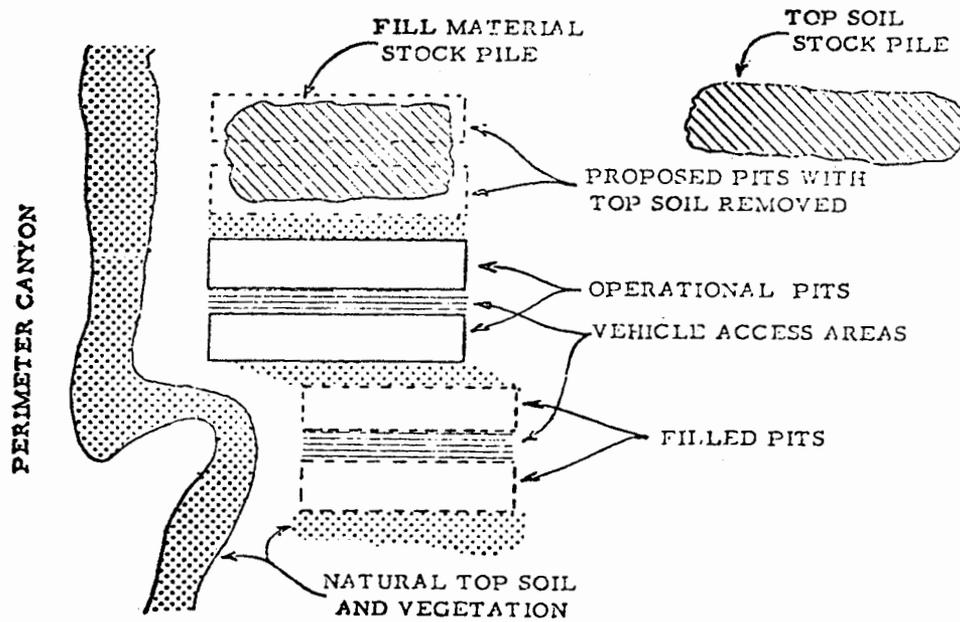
Suggested layout of disposal pits, stockpile areas and biotic sanctuaries.
